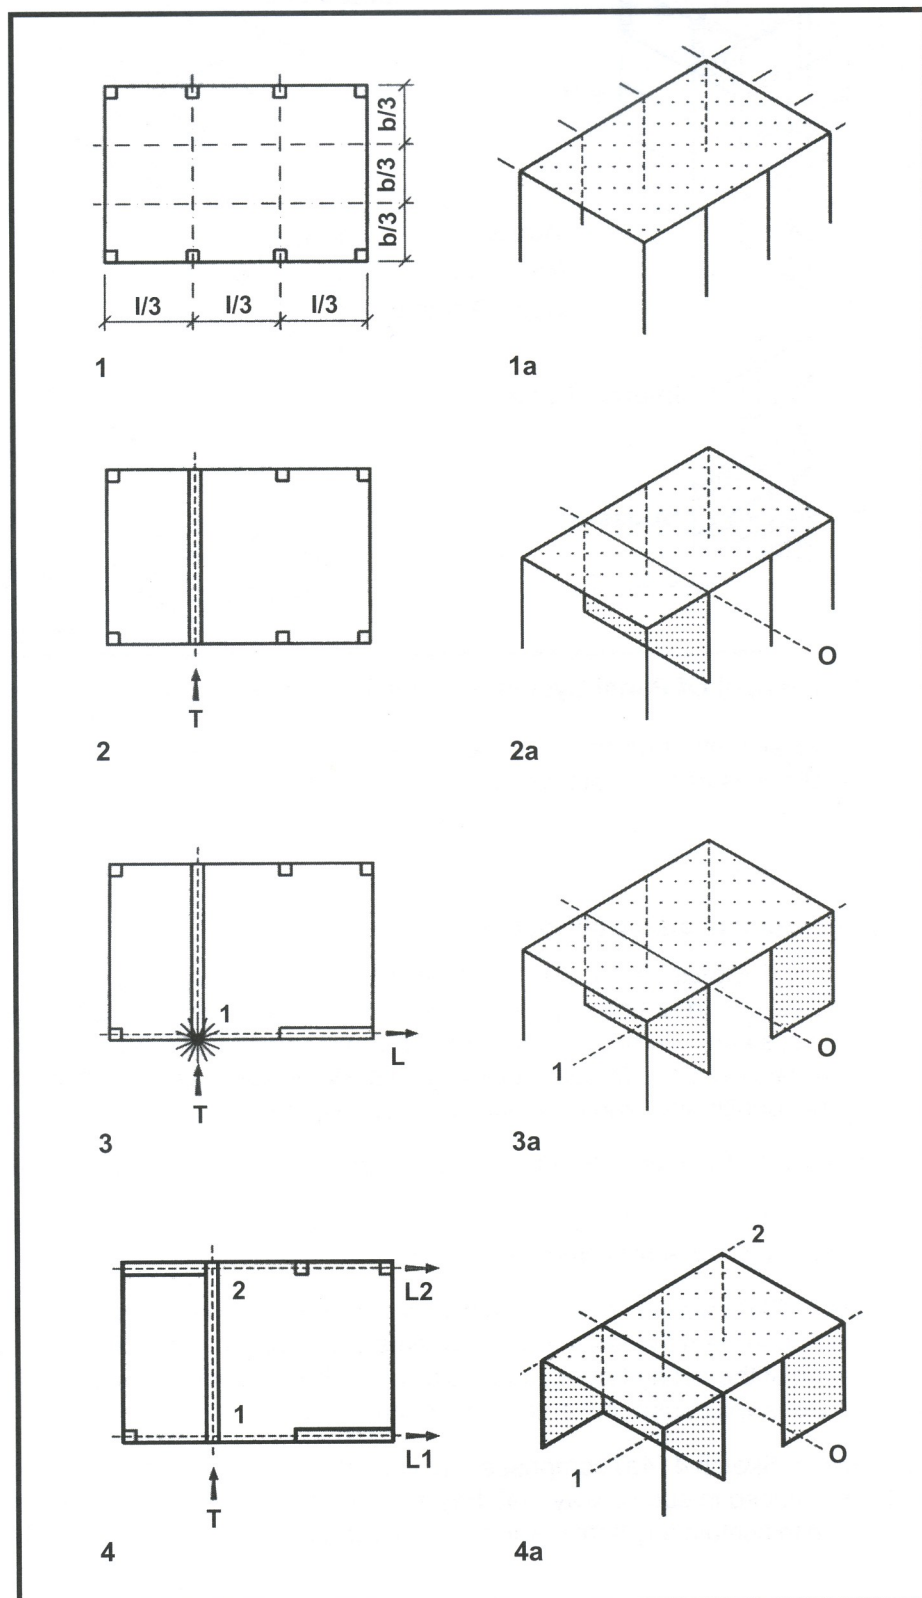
Stability Of Statically Determinate Slab-Wall System
